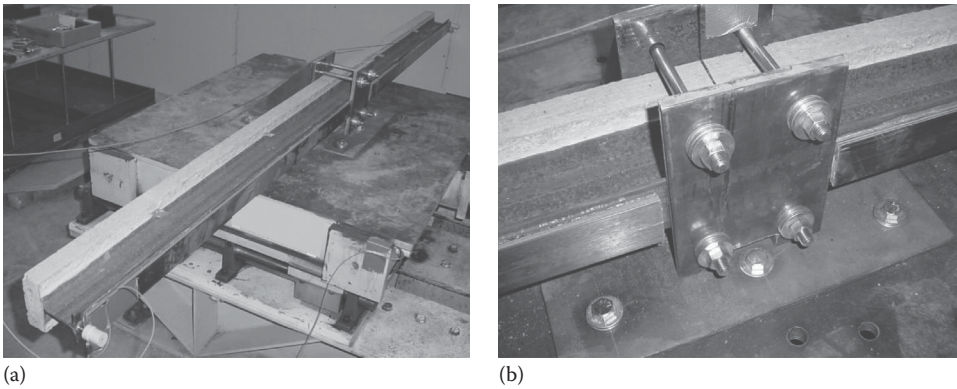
(a) Composite steel–concrete beam with constrained VE and CFRP; (b) close-up view of the beam.
